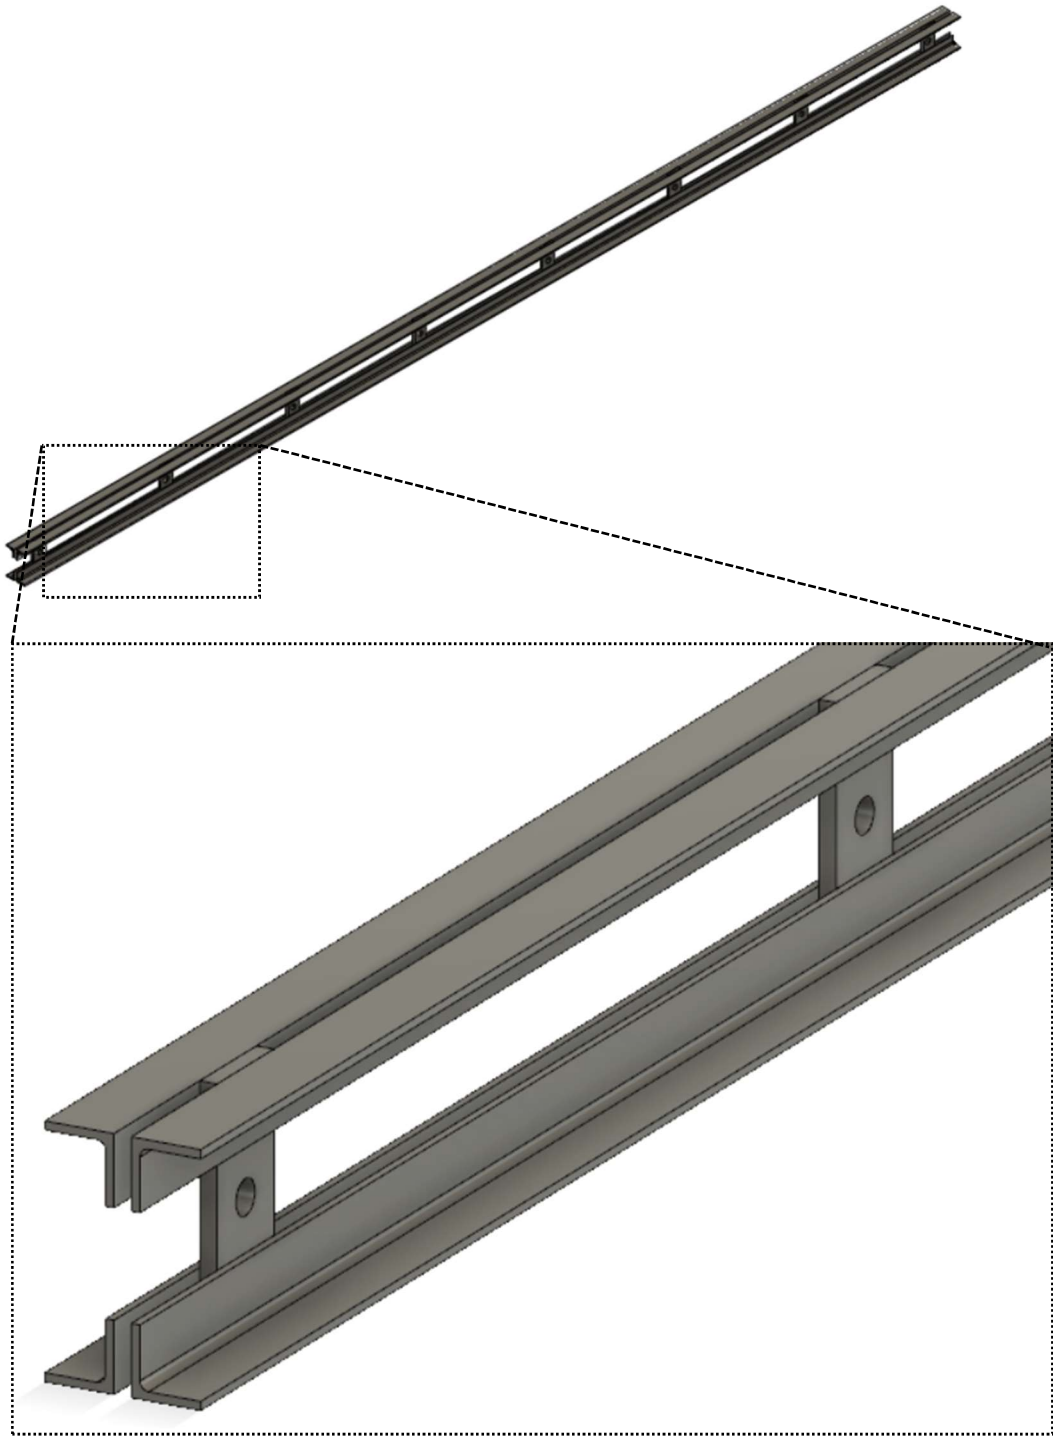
Isometric view, conceptual secondary beam component design, built-up girder
